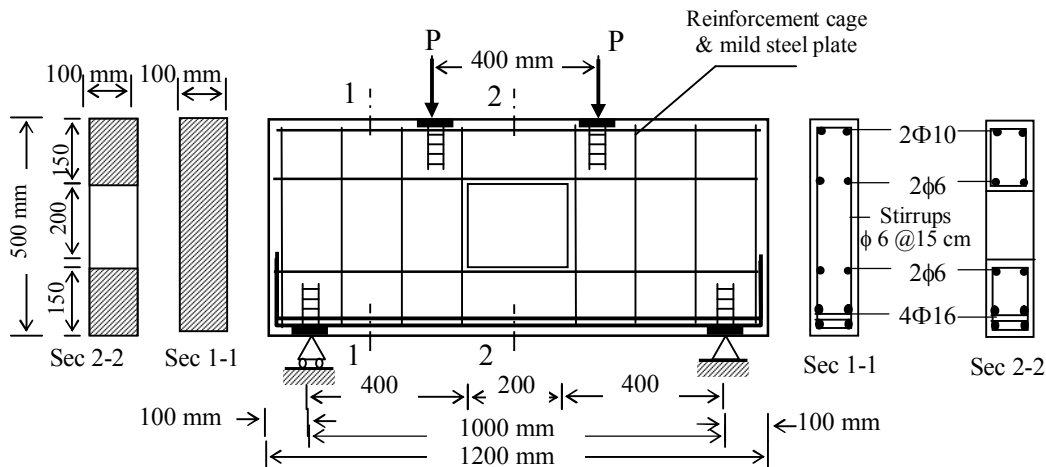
Typical dimensions and details of reinforcement of the reference beam BOR
